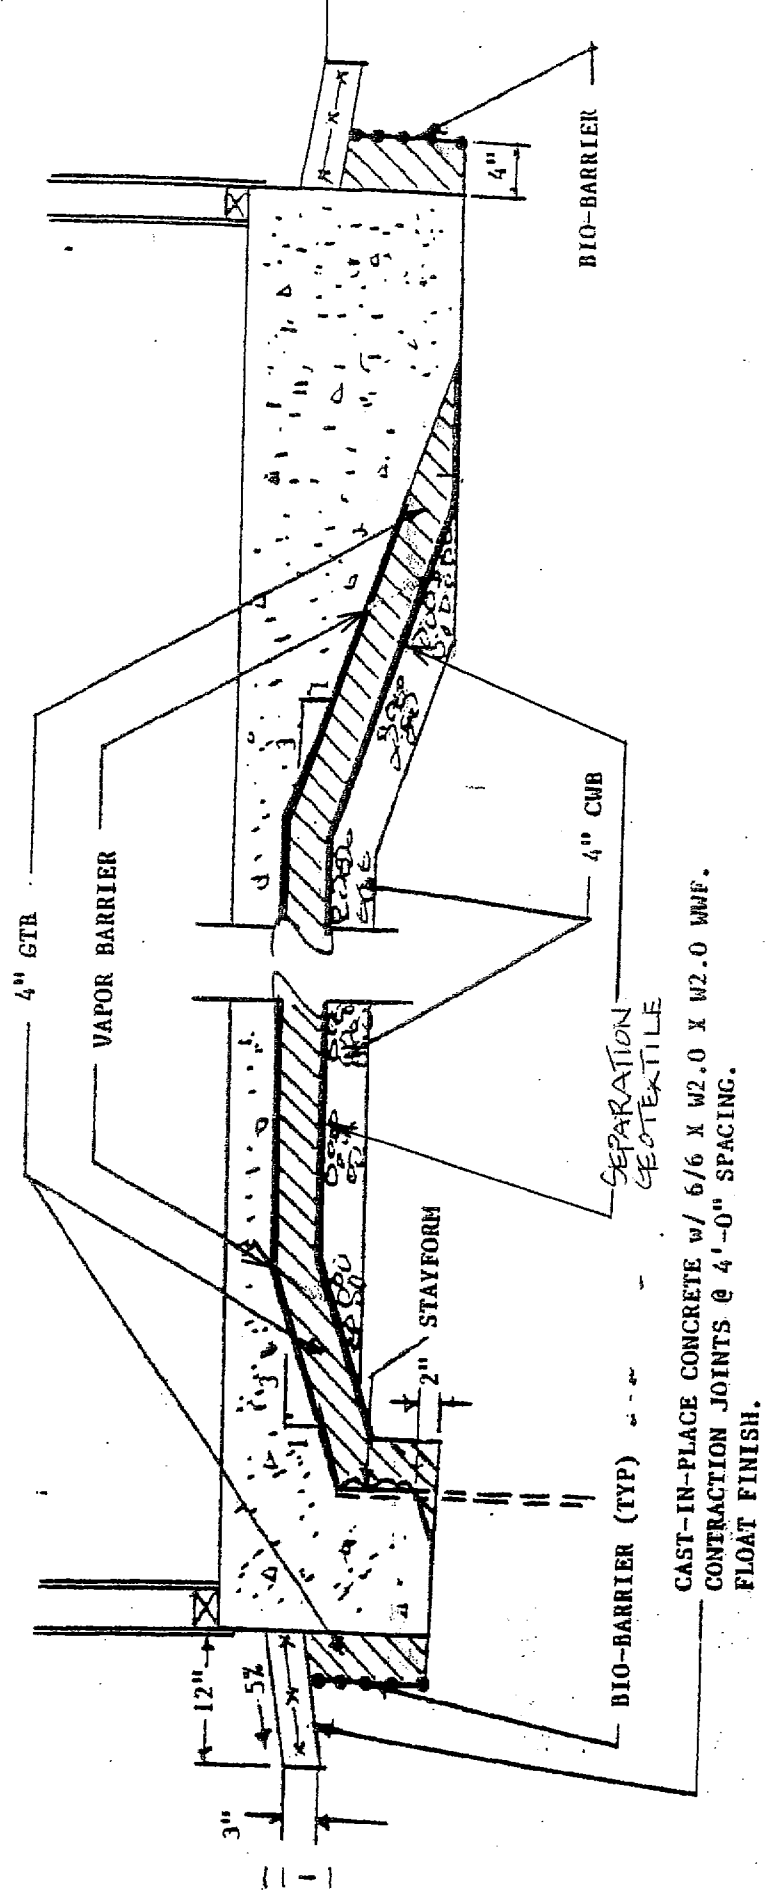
TYPICAL GTB DETAILS AT EXTERIOR FOOTINGS
